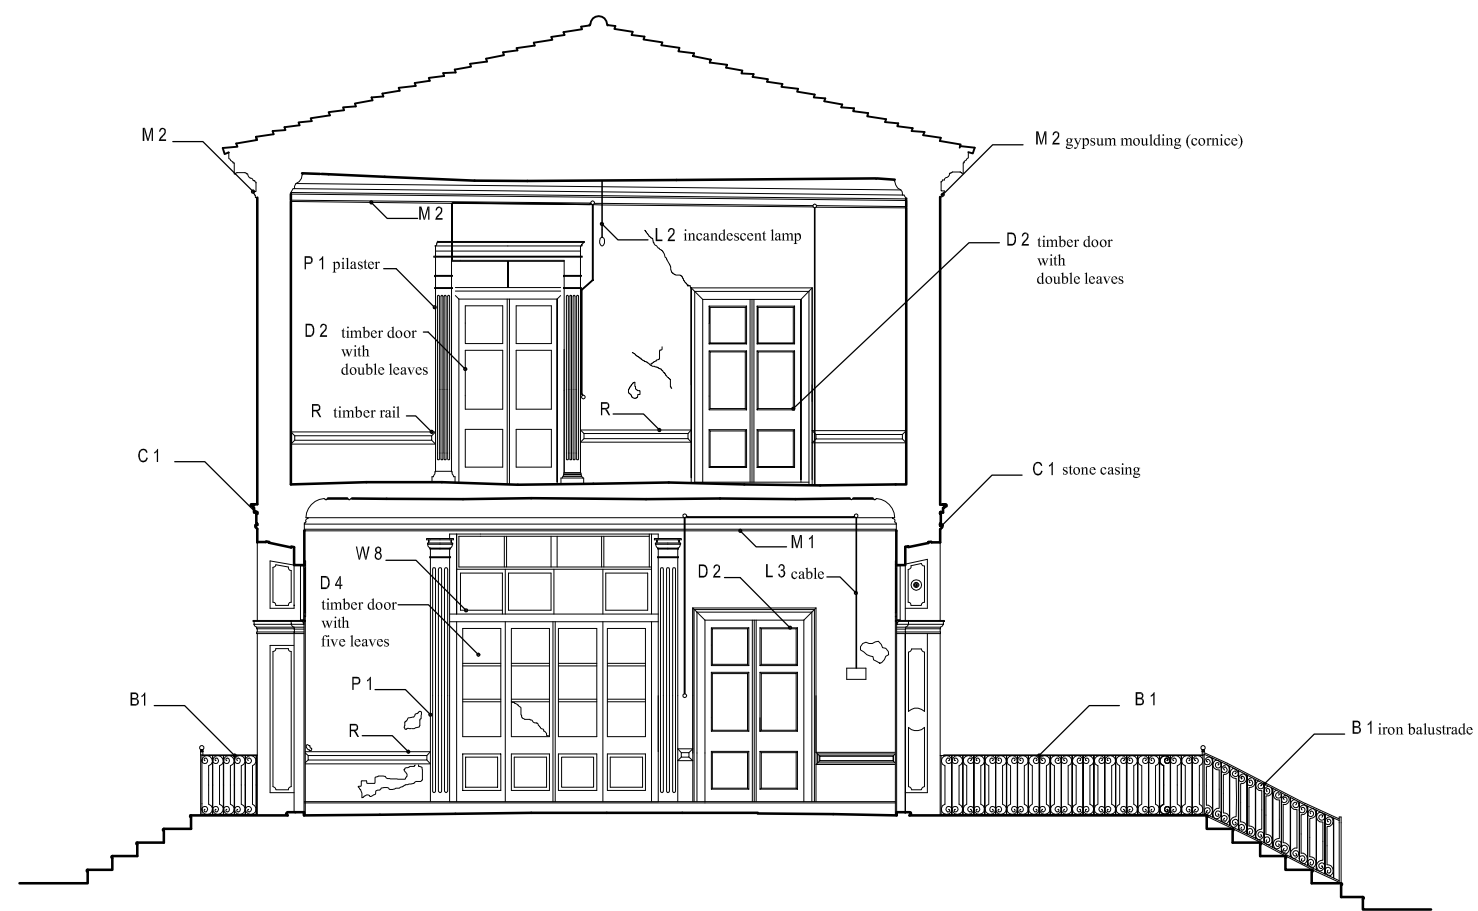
Analysis of Architectural Elements - First Floor Plan
